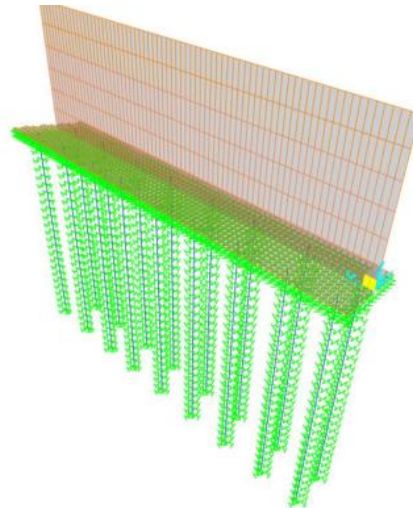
Modeling of 18 Meter Retaining Wall Structure
